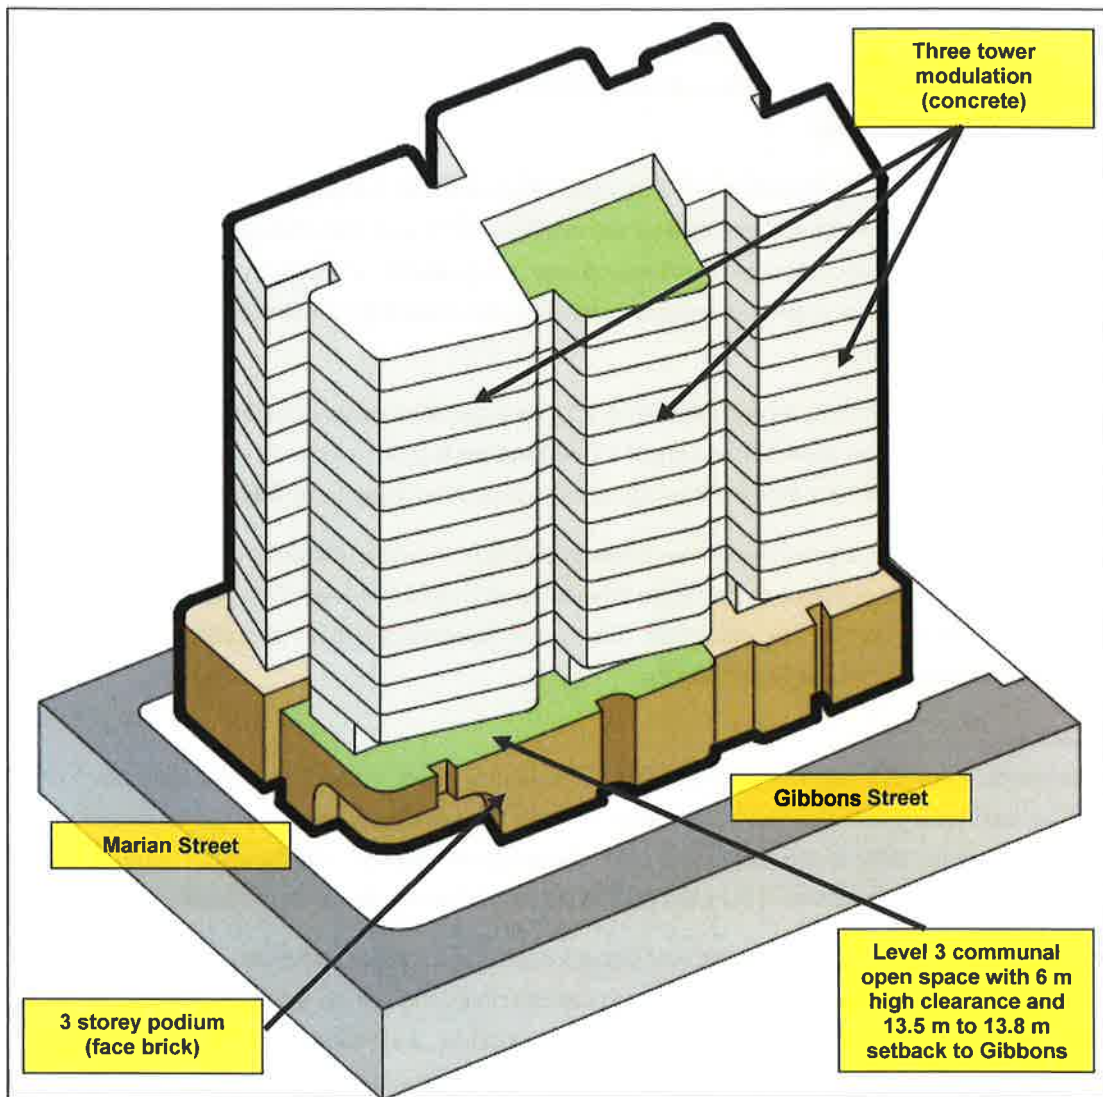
| Proposed building form viewed from the north-west (Source: Applicant's EIS)
